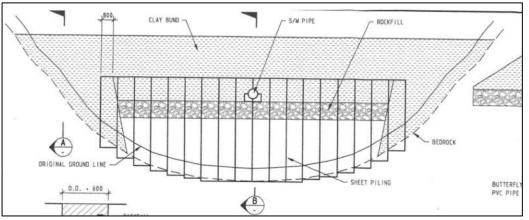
Schematic elevation of cut off wall (image courtesy of Royds Consulting 1995)
